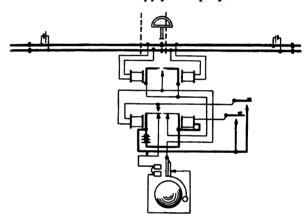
Crossing Bell Circuits, Single Track, with "Cut-out" and "Cut-in" Keys. Railroad Supply Company.
